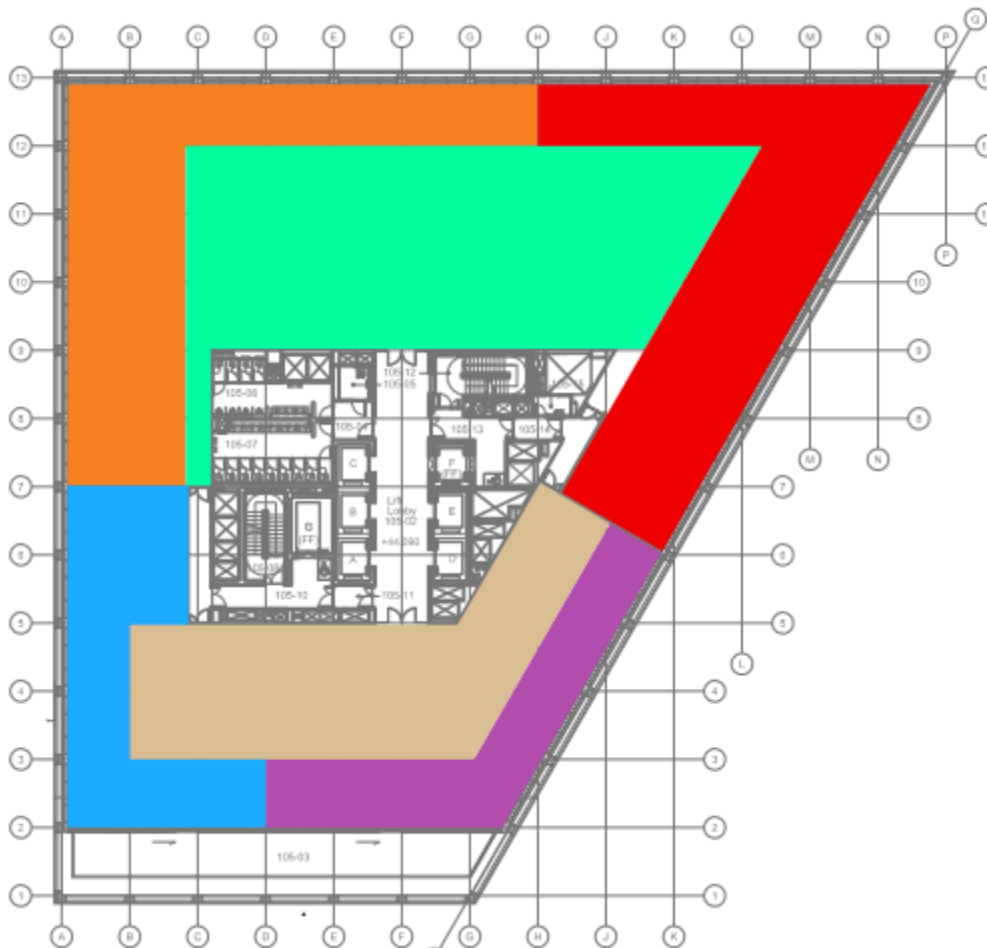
Diagram of Typical Floor Highlighting The Zonal Control Zones
